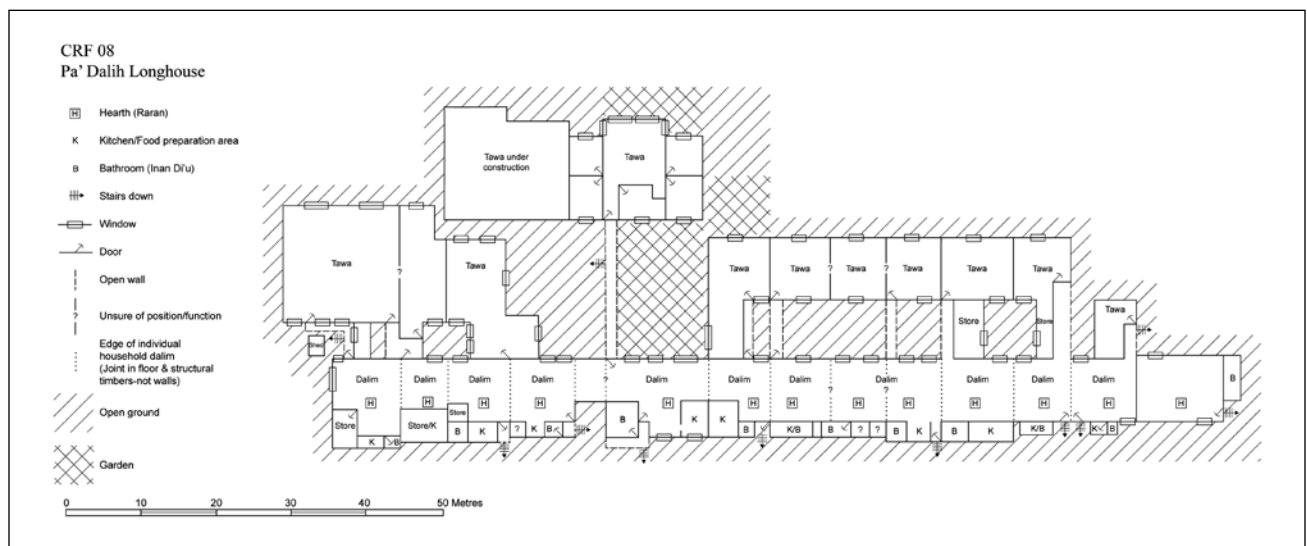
Plan of the main longhouse in Pa' Dalih, 2009. Drawing by author.
